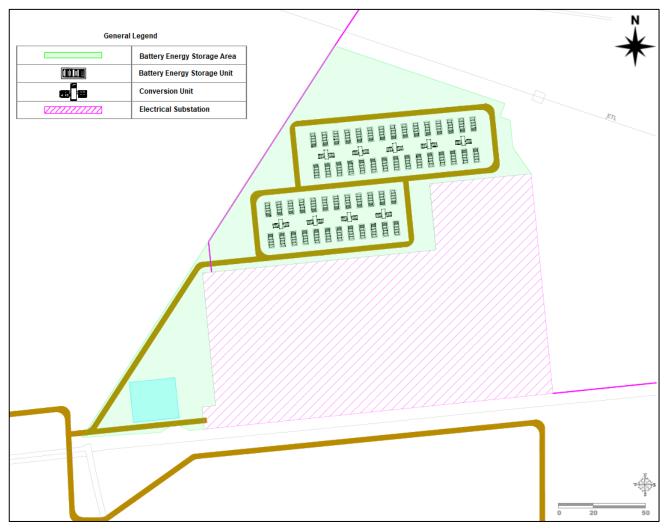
BESS and Substation Layout Plan – West Burton 3
